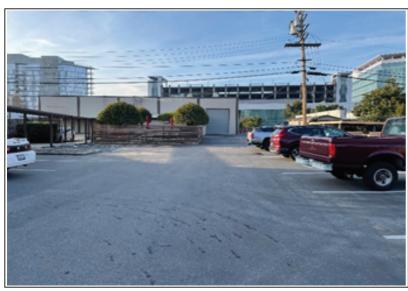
Photo of the approximate center of the project site. Facing southwest.
